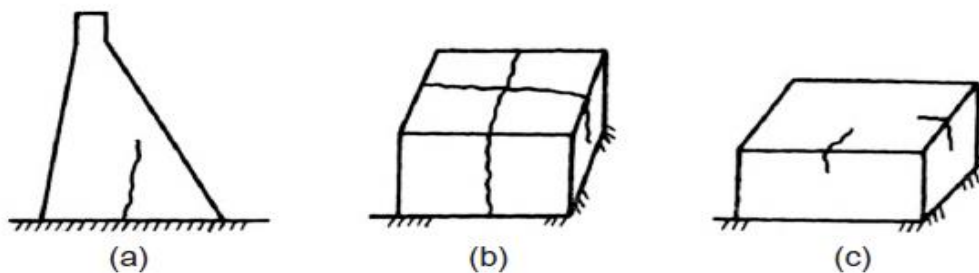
2 Sketch of different kinds of cracks in a massive concrete structure: (a) through crack, (b) deep crack or surface crack, and (c) surface crack. [4]
